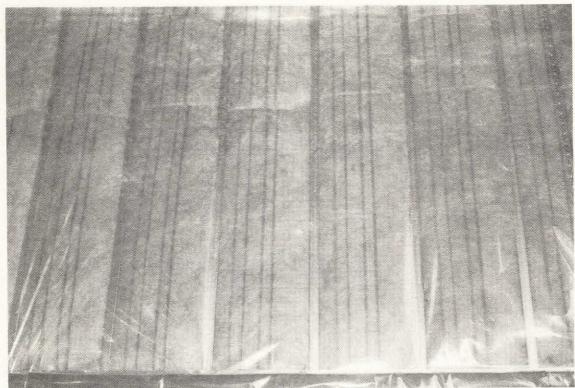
Glasclad insulation applied as exterior sheathing in conjunction with steel stud back up wall system.
